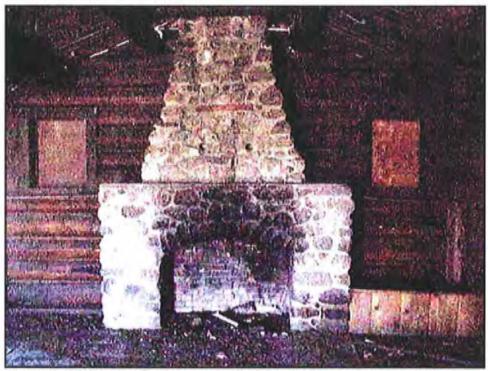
Living room fireplace, west wall of the original component, HS-1156, Hammond Cabin. Source: A&E Architects, 2004.
